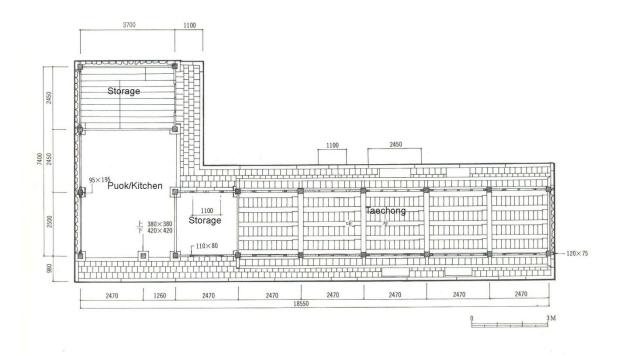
Banbingan/ Kitchen & Dinning Floor Plan (N. Zu 2003)
